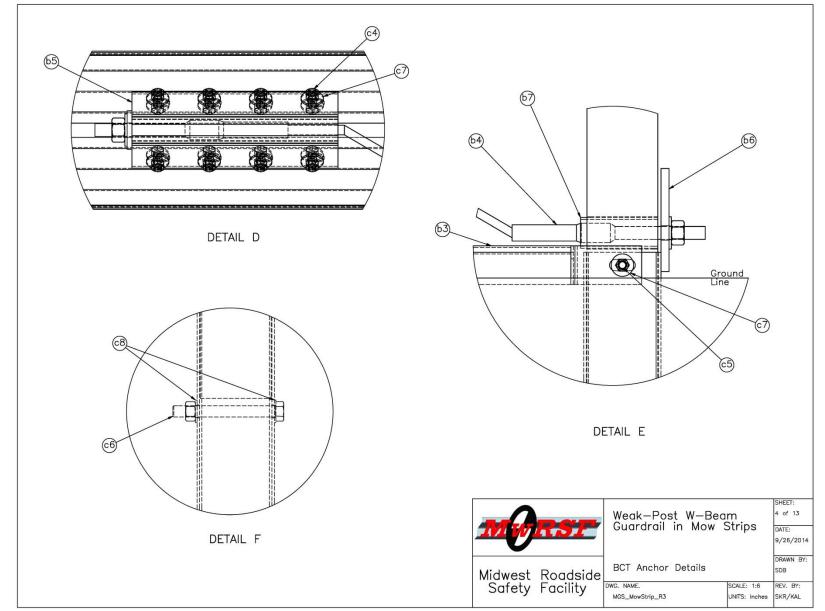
Anchorage Component Details, Test No. MGSMS-1
